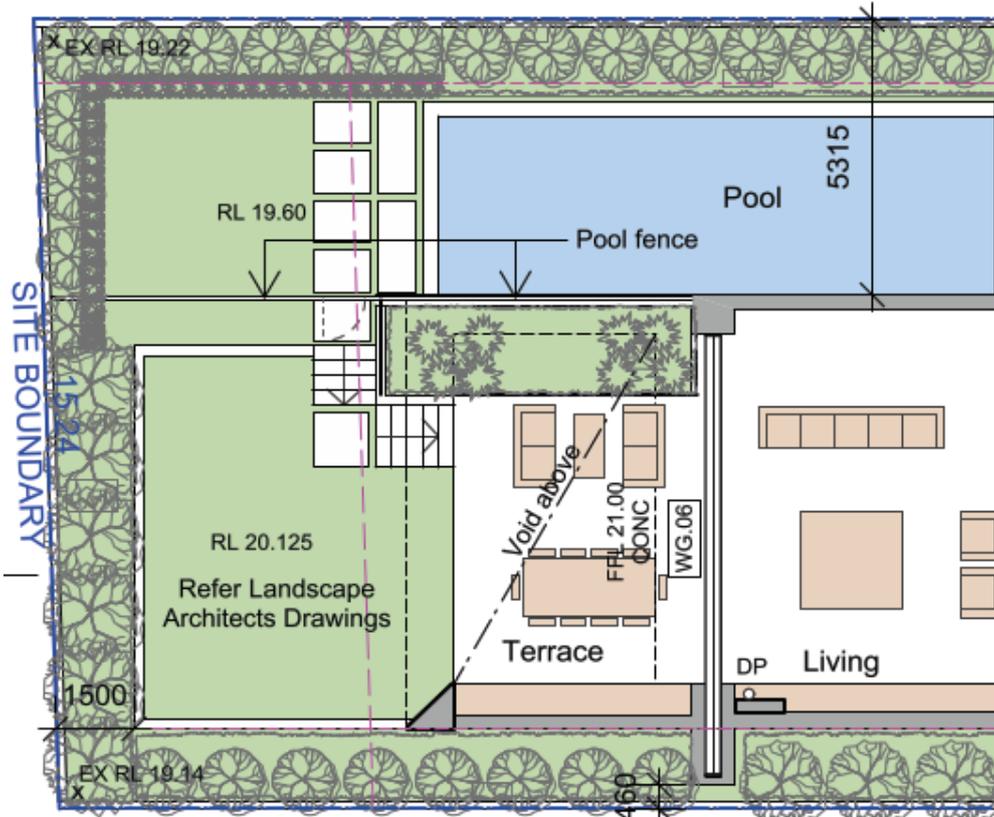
Extract of the proposed ground floor plan (source: AE Design Studio, A111 issue F, dated 08/12/2020).
